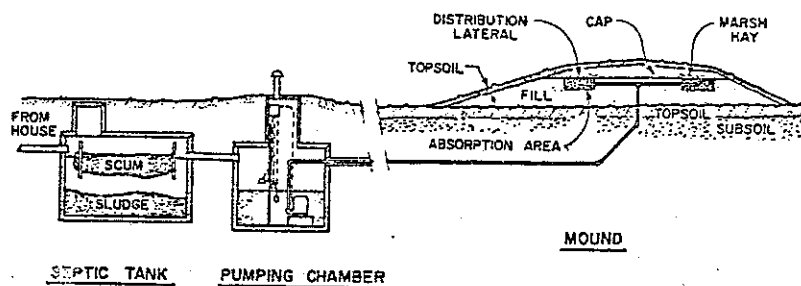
A cross-section of a septic tank mound system for on-site wastewater disposal.
